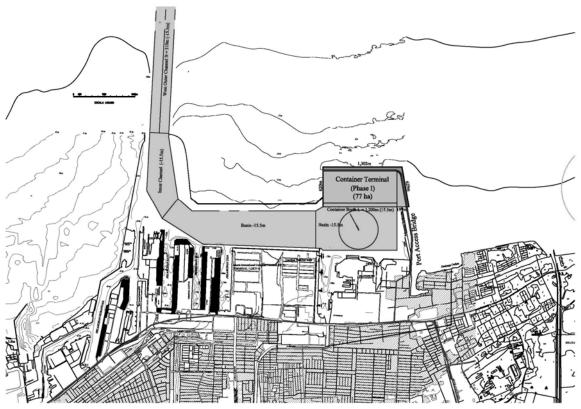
Facility Layout Plan of North Kalibaru Expansion in Phase I (Alternative-1)
